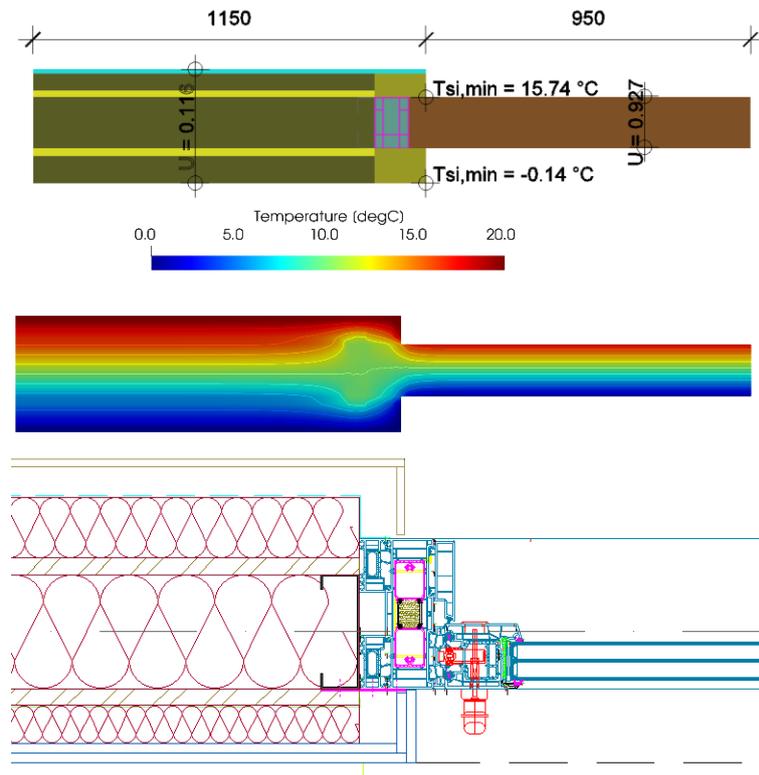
Example of analyzed thermal bridge case – door and wall junction.
